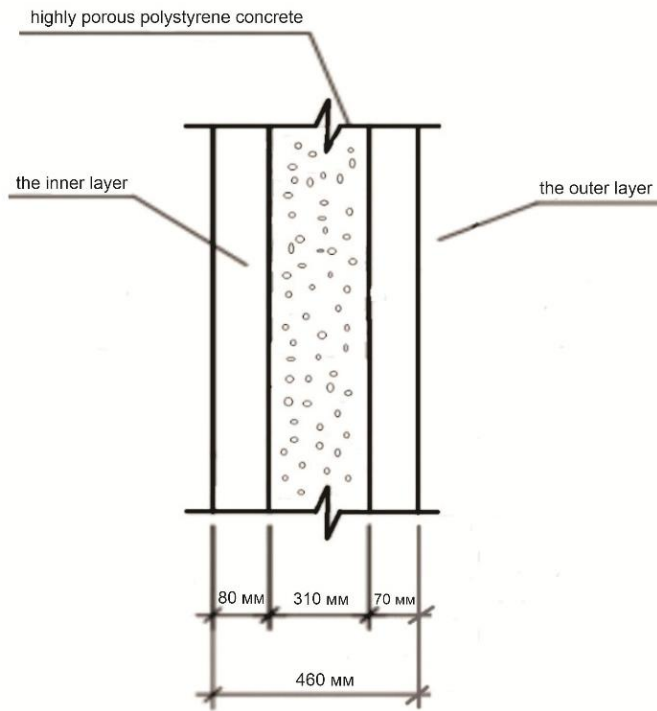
Wall panel with heat insulation layer of highly porous expanded polystyrene concrete (author’s material)
